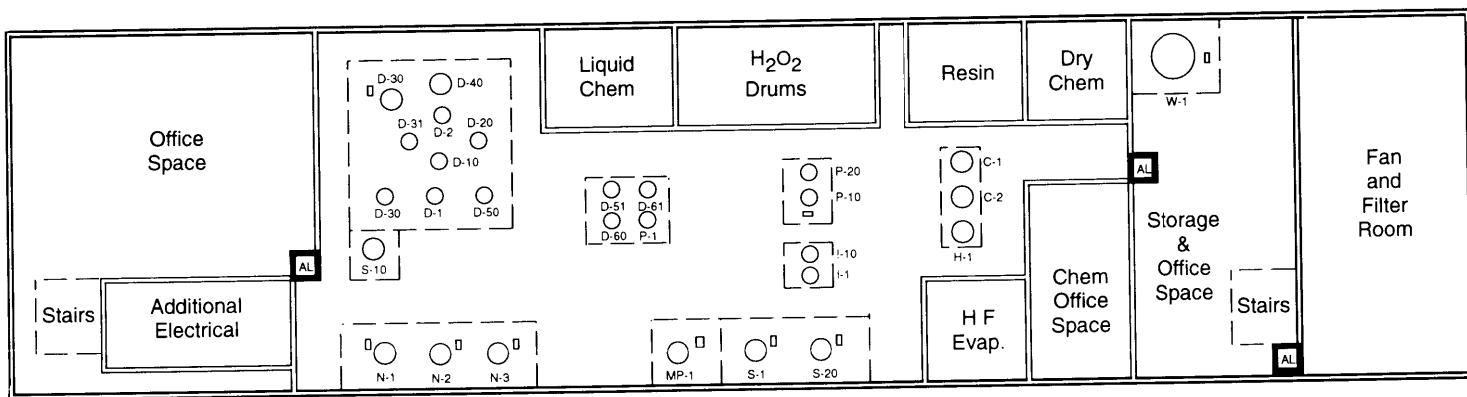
Plutonium Recovery Facility Second Level Floor Plan
